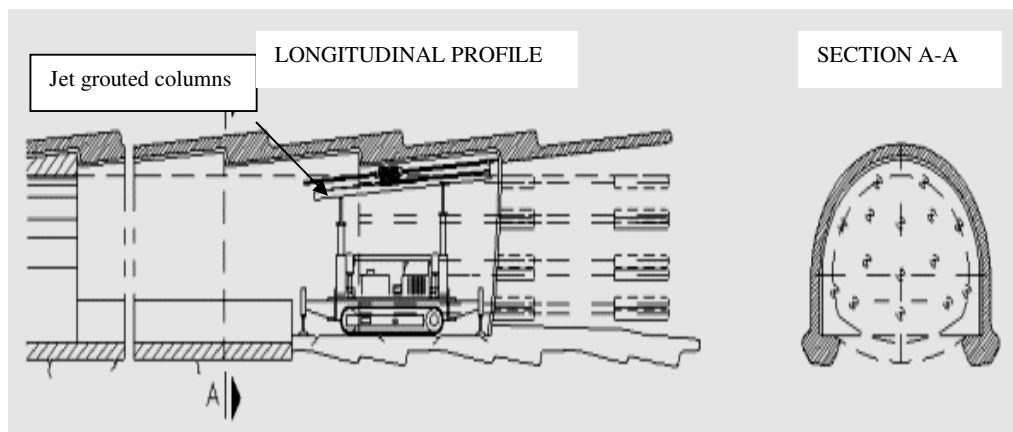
Schematic diagram of Horizontal Jet Grouting (Rocksoil S.p.A).
